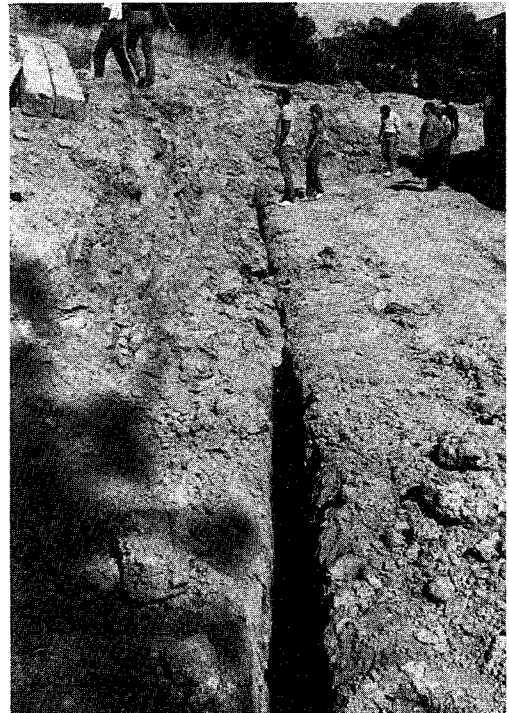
Trench for Retaining Wall at Toe of Slope Squeezed Shut by Slope Movement.
